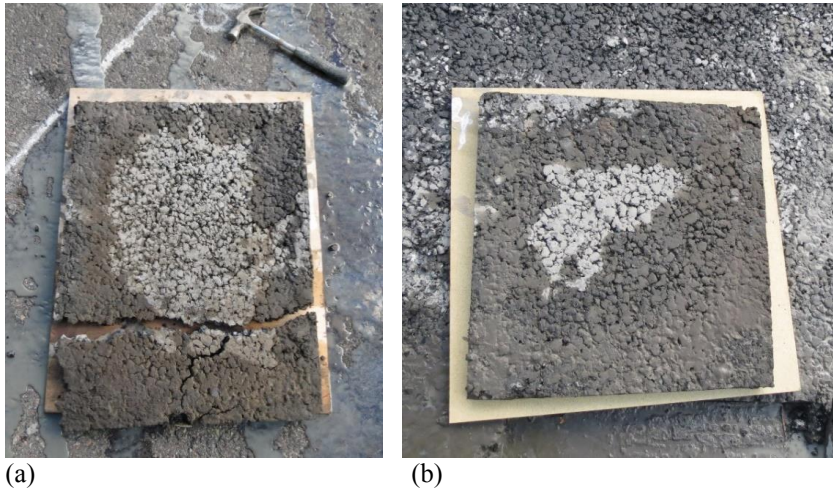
Vt12 sampling: pavement slab 1 and b) slab 4.
